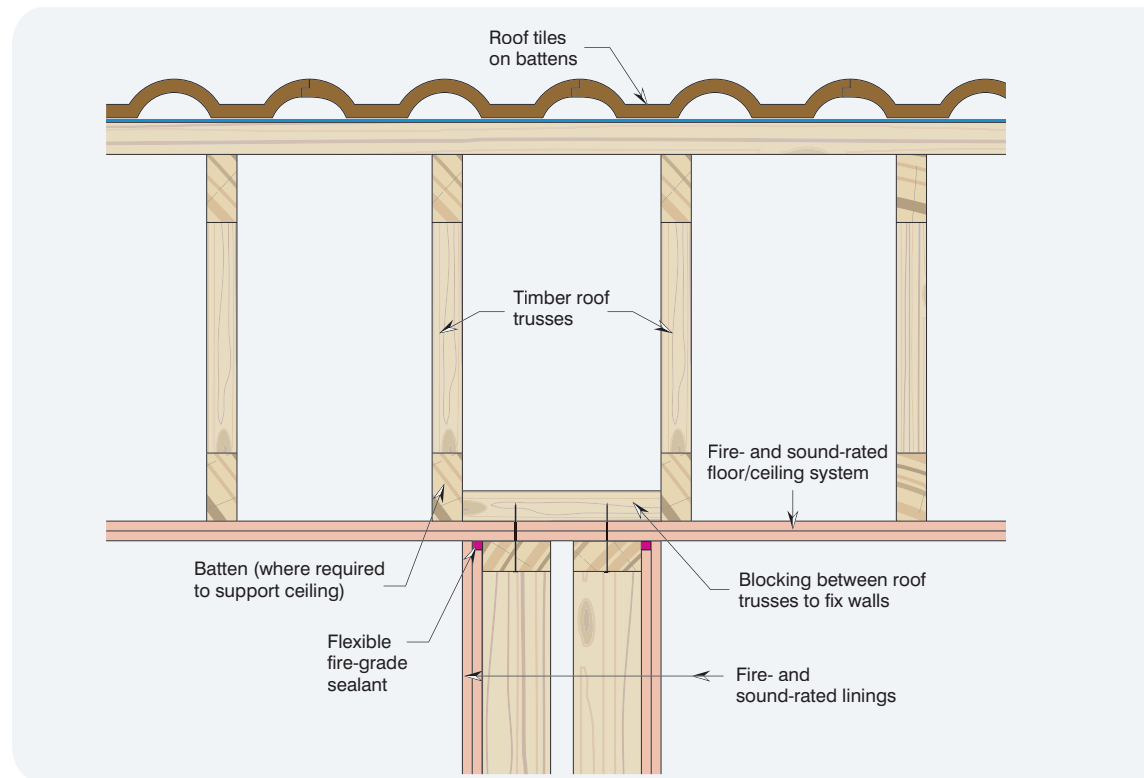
SOU wall abutting a Resistant to Incipient Spread of Fire ceiling.
